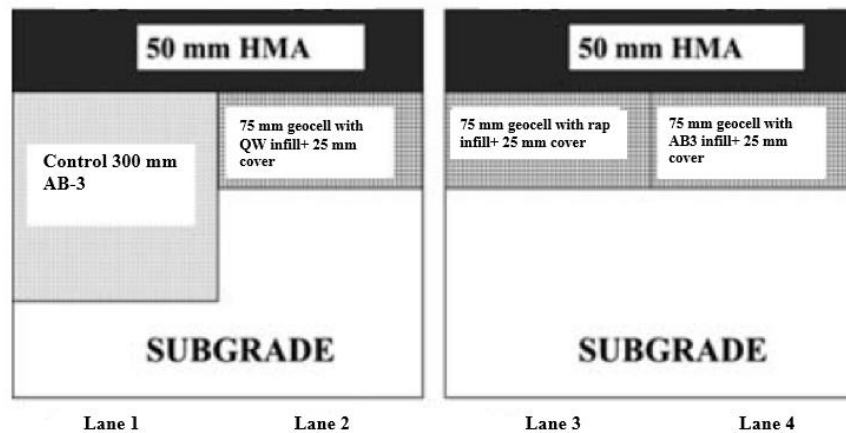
Pavement cross sections for the first test (adapted from Bortz et al., 2012).
